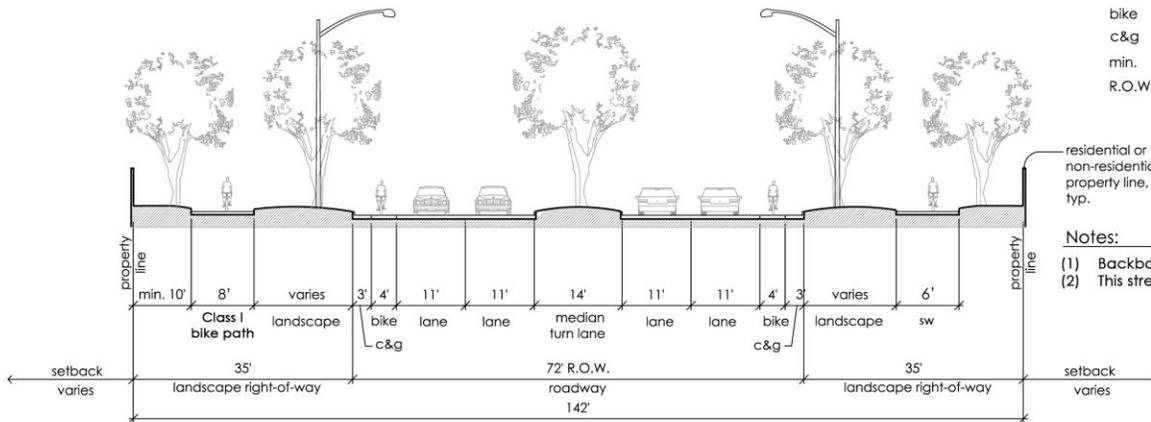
Roadway Sections – Major Arterial Street (16<sup>th</sup> Street)
